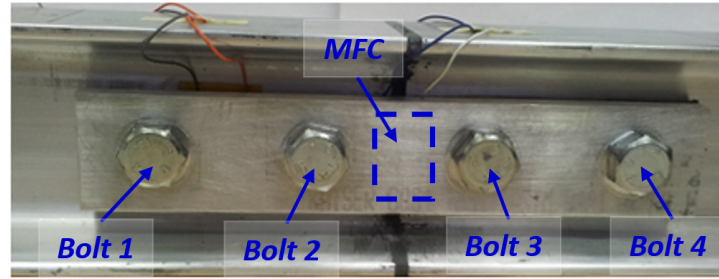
Front view of the lab-scale insulated joint showing the four bolts and the location of the MFC transducer attached to the inner surface of the joint bar.
